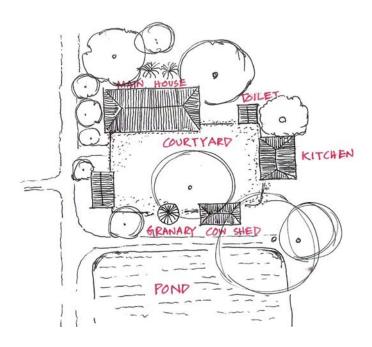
Figure showing a layout of a typical household of rural Bangladesh (Source: Author 2013)
